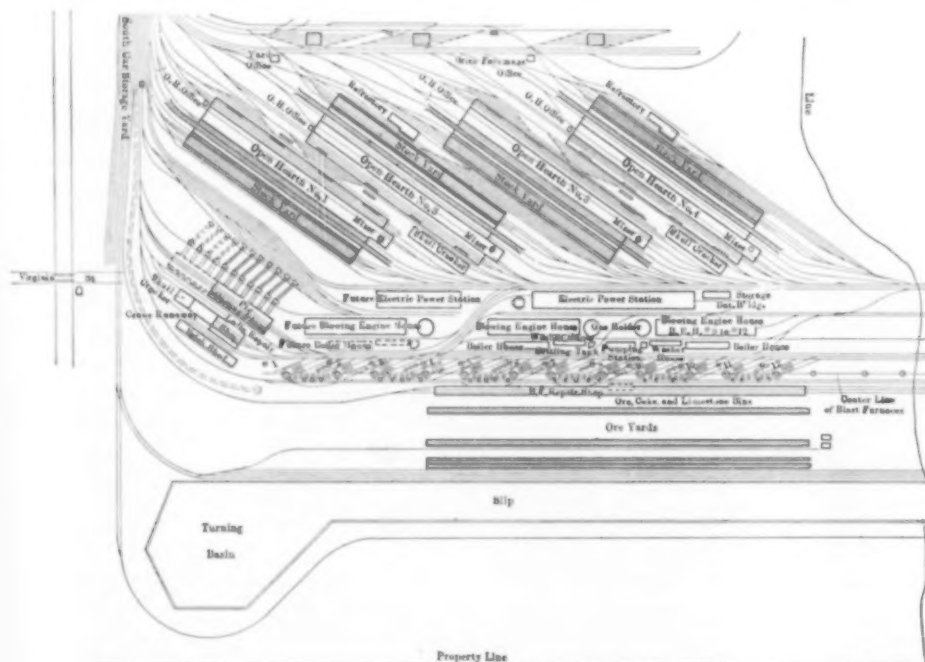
GENERAL GROUND PLAN AND TRACK LAYOUT FOR THE PLANT OF THE INDIANA STEEL COMPANY AT GARY, IND.
